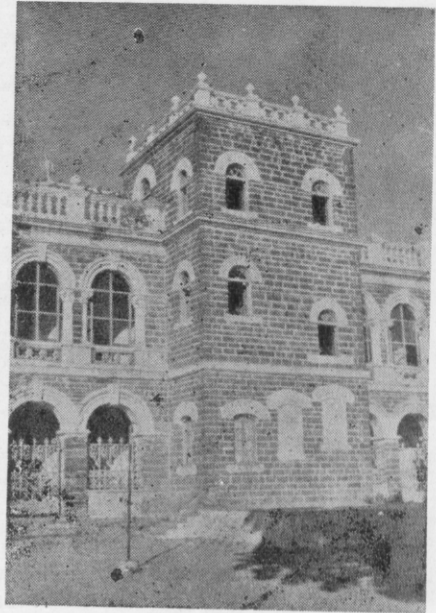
Alfred High School at Bhuj, India. A dressed stone masonry construction. It is a hundred year old buiding and has withstood several earthquakes due to excellent construction.
